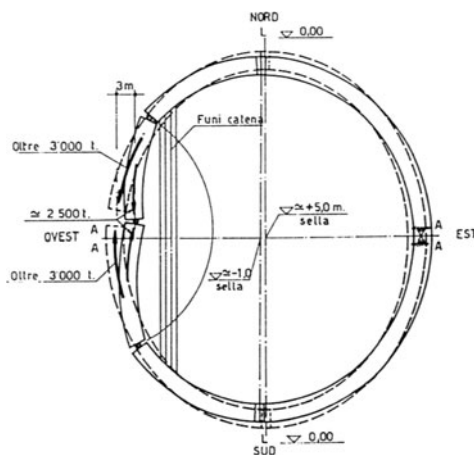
Milan Sport Hall – roof collapse by snow load (1980)
